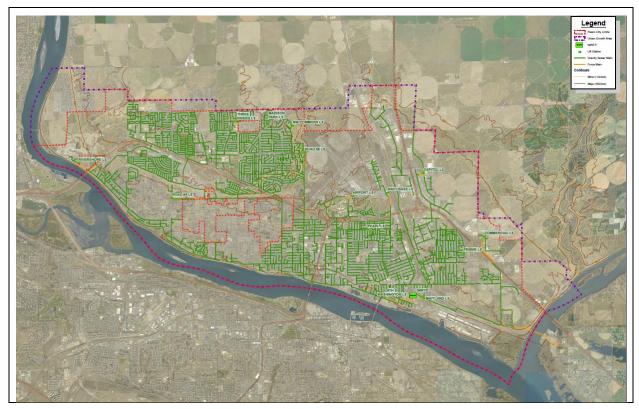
PASCO SEWER PLAN ADDENDUM
